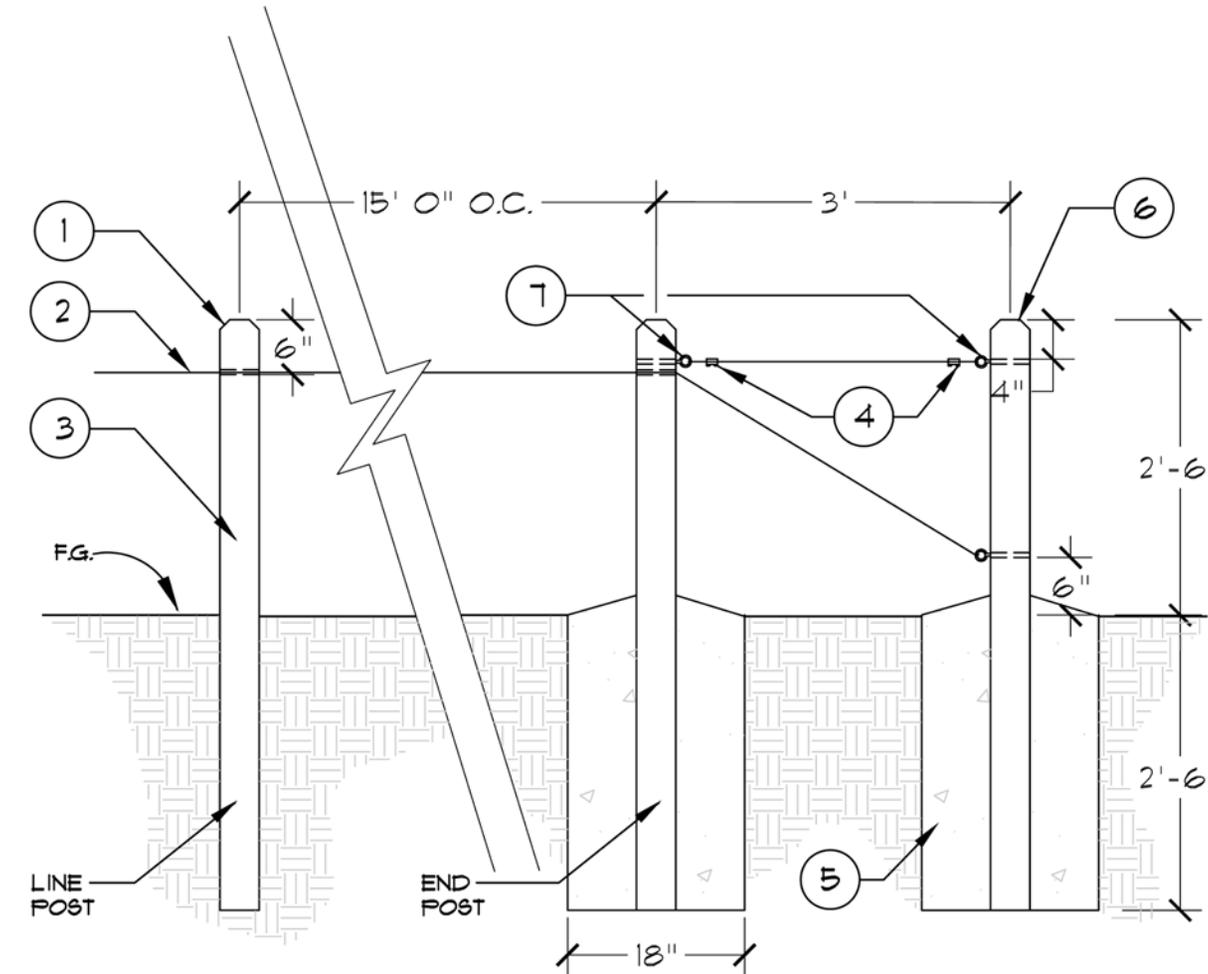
WALLS AND FENCING CONCEPTS
